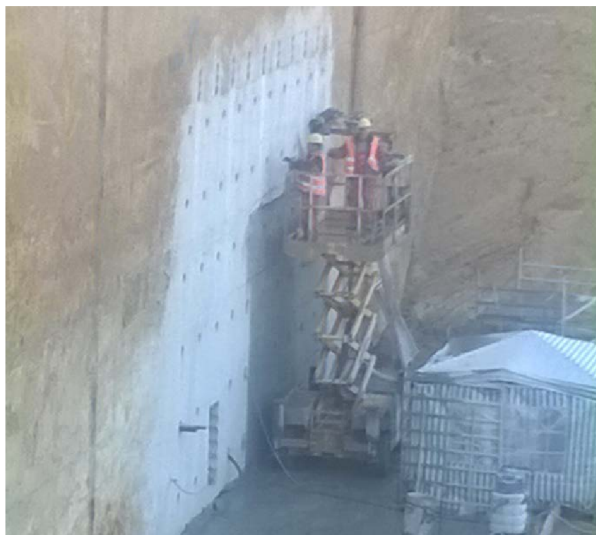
Construction Area of GAF: wall of existing hall is opened to connect new beam line tunnel towards FAIR.
